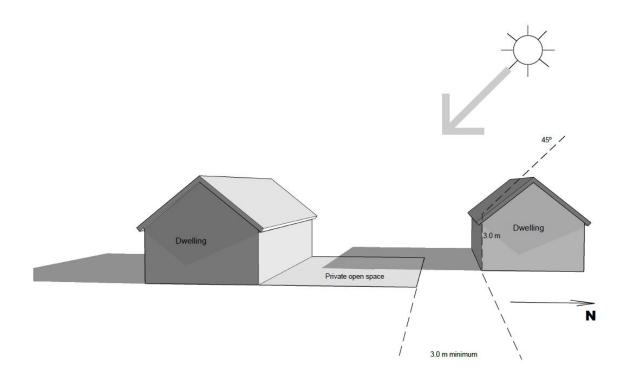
Separation from the private open space of another dwelling on the same site as required by clause 9.4.4 A1(a)
